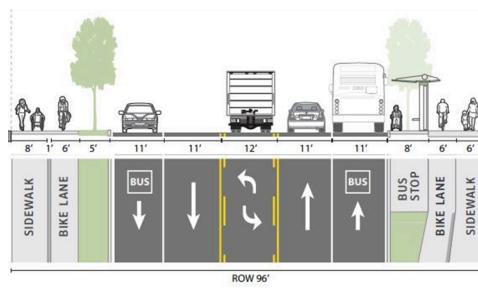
C Street Elements and Widths for 72nd Avenue
